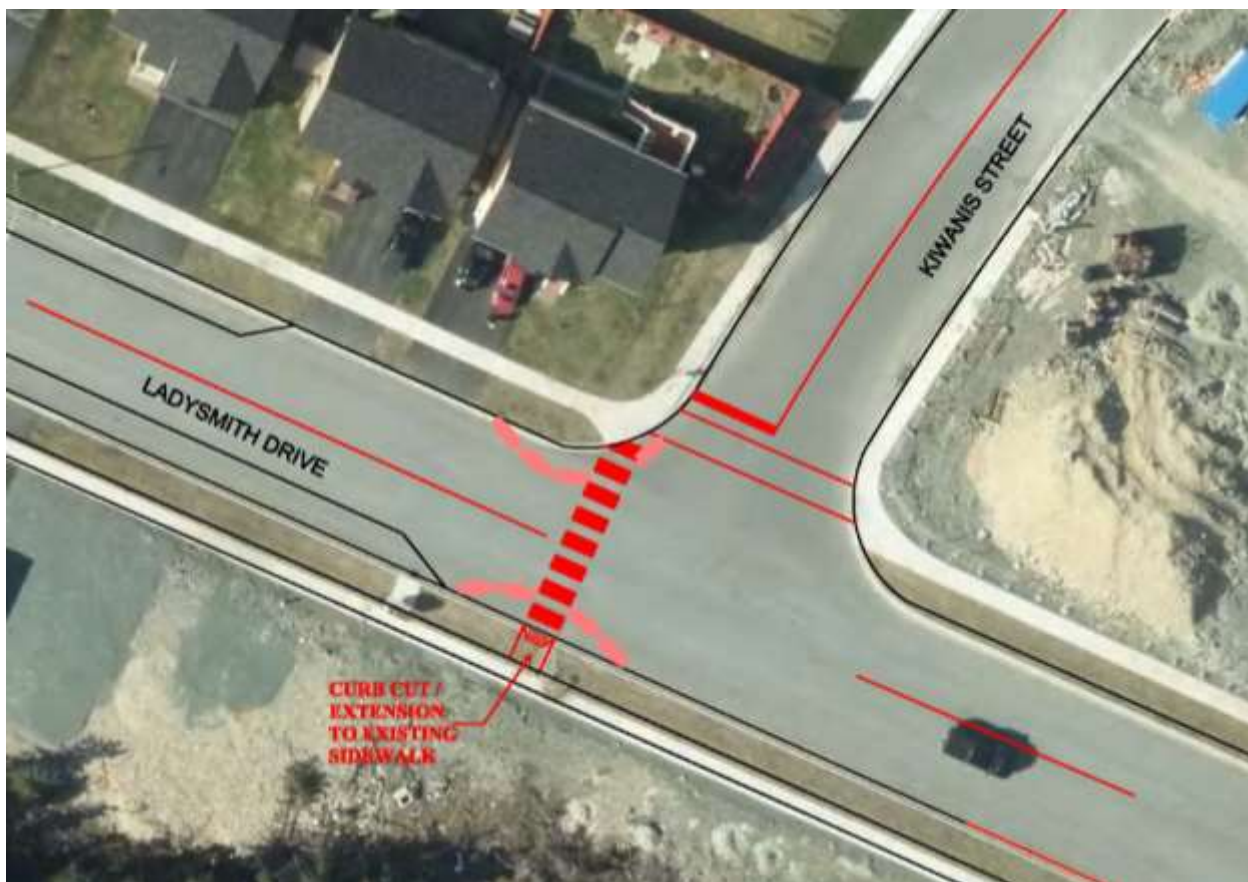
Ladysmith Drive at Kiwanis Street Implemented
